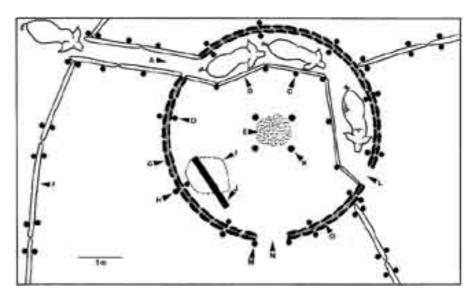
Approximate layout (aerial view) of the men's house at llamik. A) pig run to the forest; B) pig wall (*kanggok*); C) pig wall upright (*isok* or *andok*); D) inner support post (*owak*); E) fireplace (*ulanggen*); F) pig fence; G) wall plank (*obahat*); H) outer support post (*langwop*); I) entrance hole to upper floof (*kekeruk*); J) ladder to upper floor (*jal*); K) central support post (*ebisengge*); L) pig door (*wamkekeruk*); M) door post (*kepukano*); N) main door (*apkekeruk*); O) wall lining (*hulubit*).
